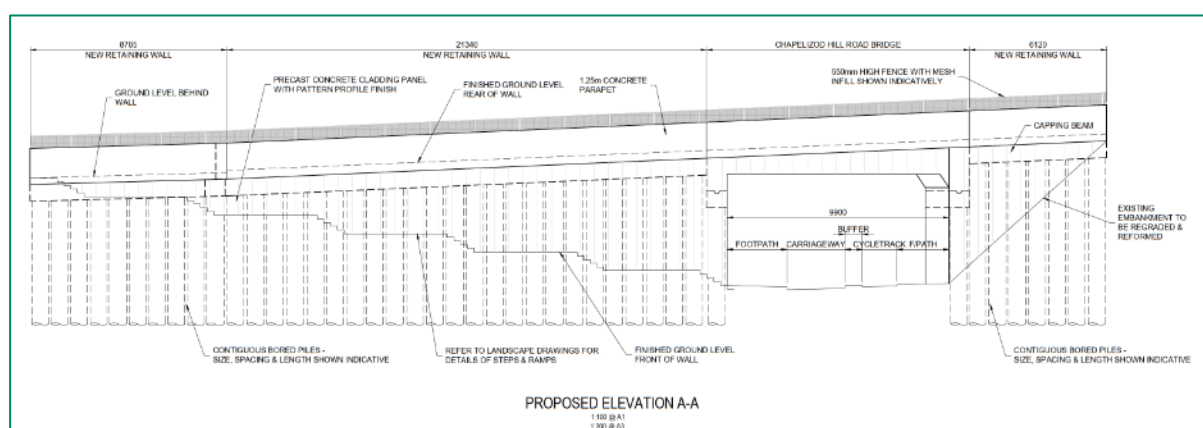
Elevation of Chapelizod Hill Road Retaining Wall
